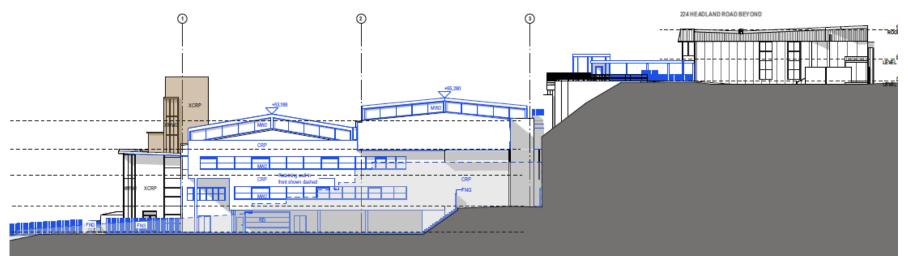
Proposed southern elevation plan (TZG Architects, A-211, Revision A, October 2019)
